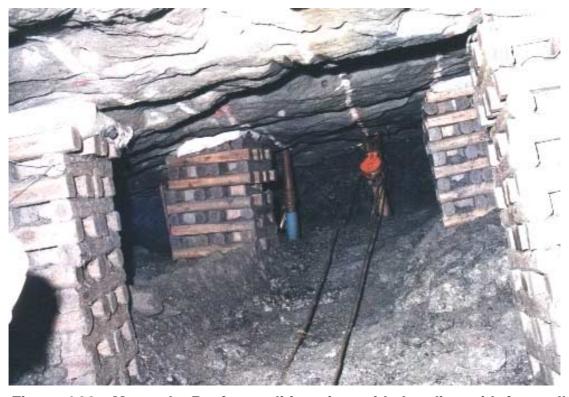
Merensky Reef - conditions in a wide heading with footwall lifted gully at 2000m below surface
